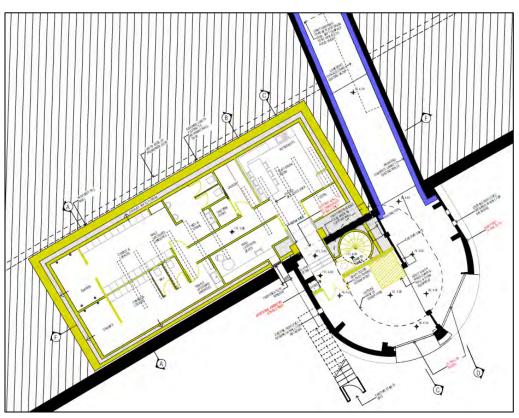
Approved beach level floor plan of Lifeguard Tower, Tunnel 2 and Amenities block.
